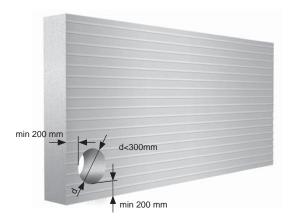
Guidelines on making small openings in BALEXTHERM-PU panels
